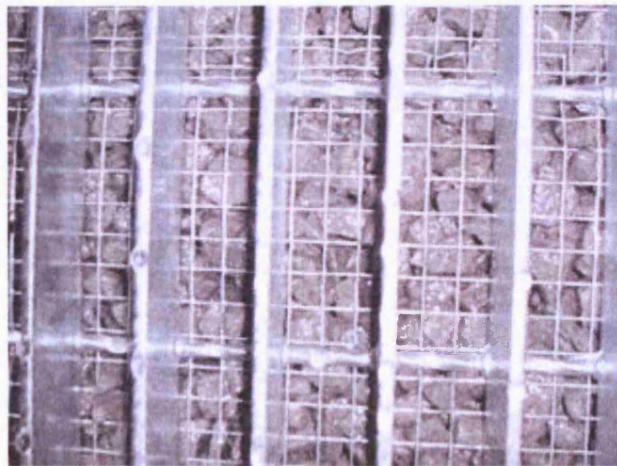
View facing west of the concrete block support arrangement for the plenum floor
